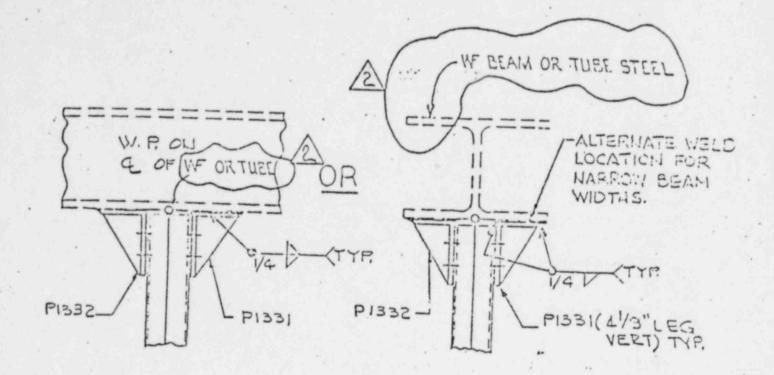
TYPICAL VERTICAL HANGER CONNECTION
